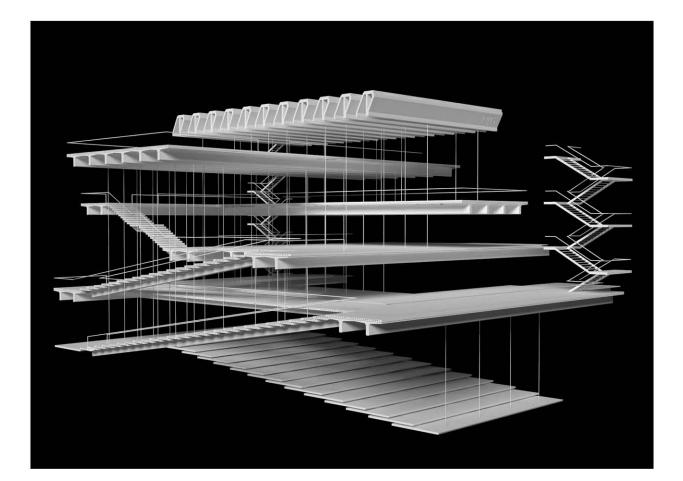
Precast Concrete Single T Beam Platforms: Containing Mechanical System and Structural Strategy
